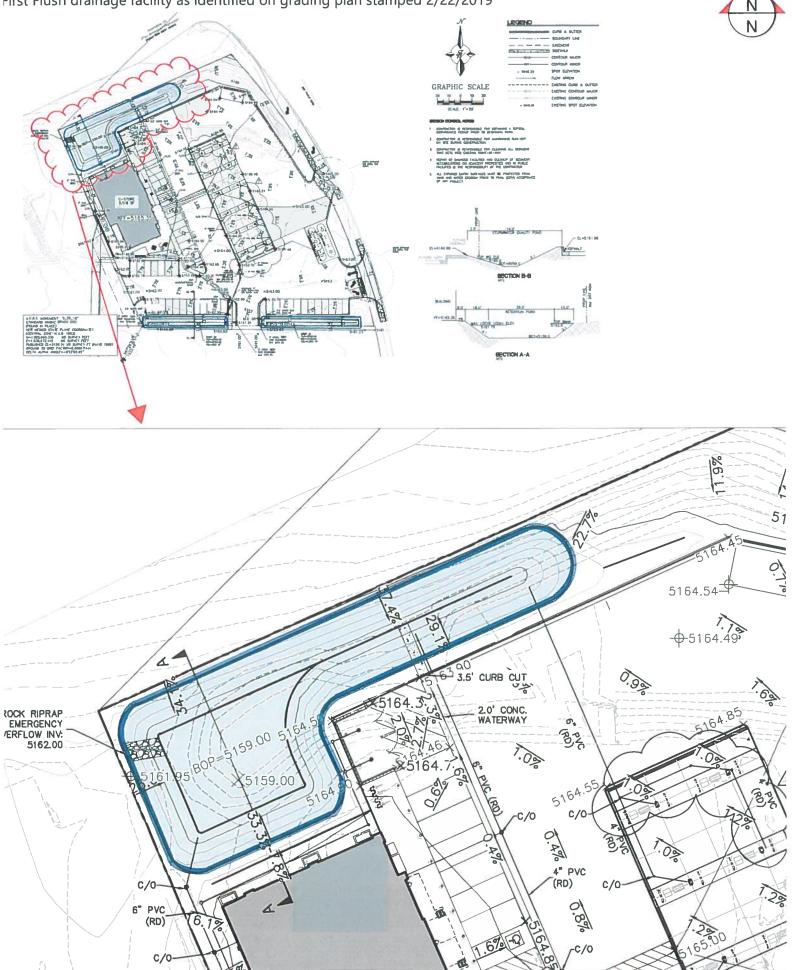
First Flush drainage facility as identified on grading plan stamped 2/22/2019
